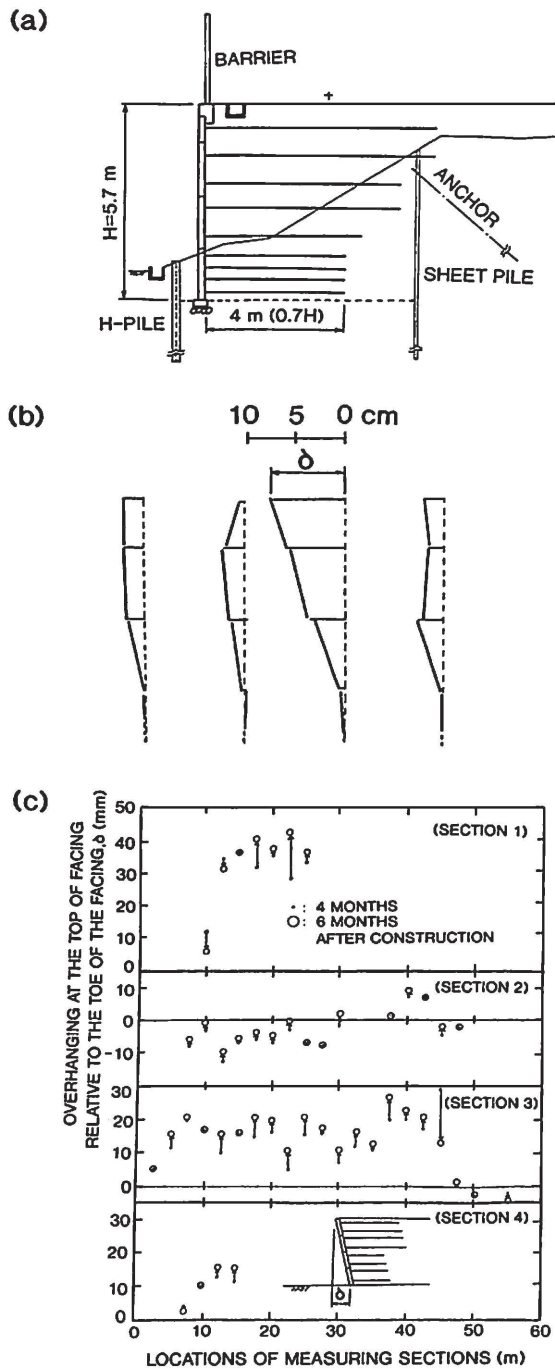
Terre Armee Wall constructed in 1981 in Yamagata Prefecture; a) typical cross-section, b) several typical facing shapes measured in November 1991, c) overhanging δ at the top of facing in relation of the toe of wall measured four and six months after the construction of the wall.
